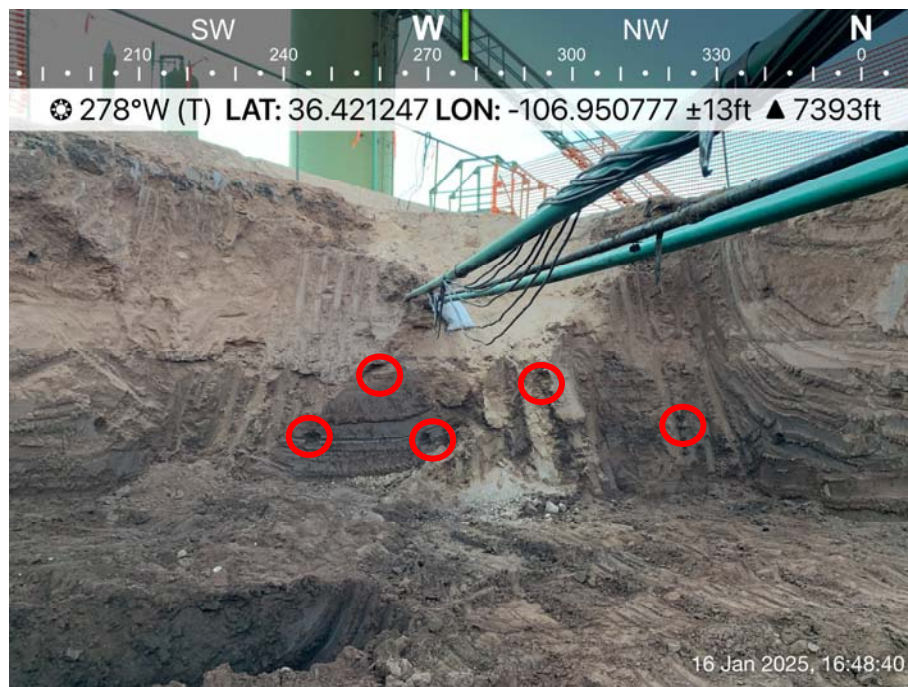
SS10 collected as a five-point composite sample 4-10 ft bgs from west sidewall of excavation.
